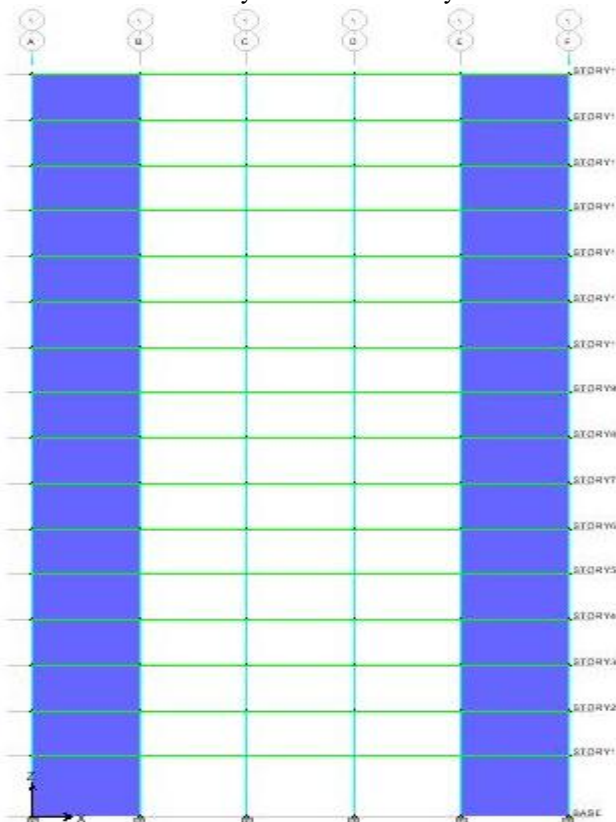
First storey as soft storey with peripheral bay as core infilled masonry walls.
